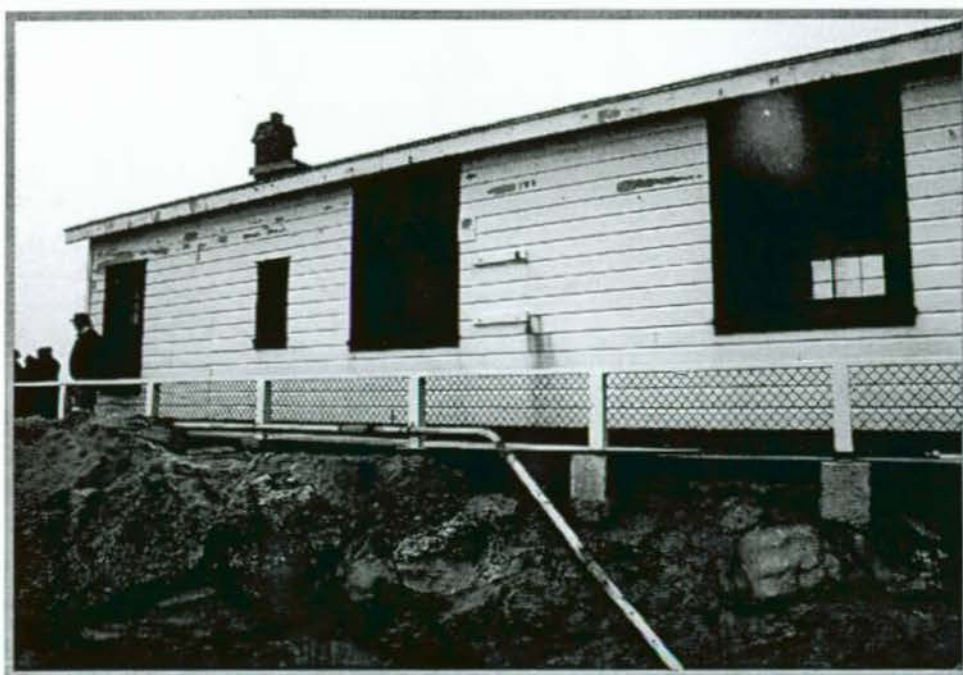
The west elevation of the Equipment building showing paint loss and the broken conduit.
